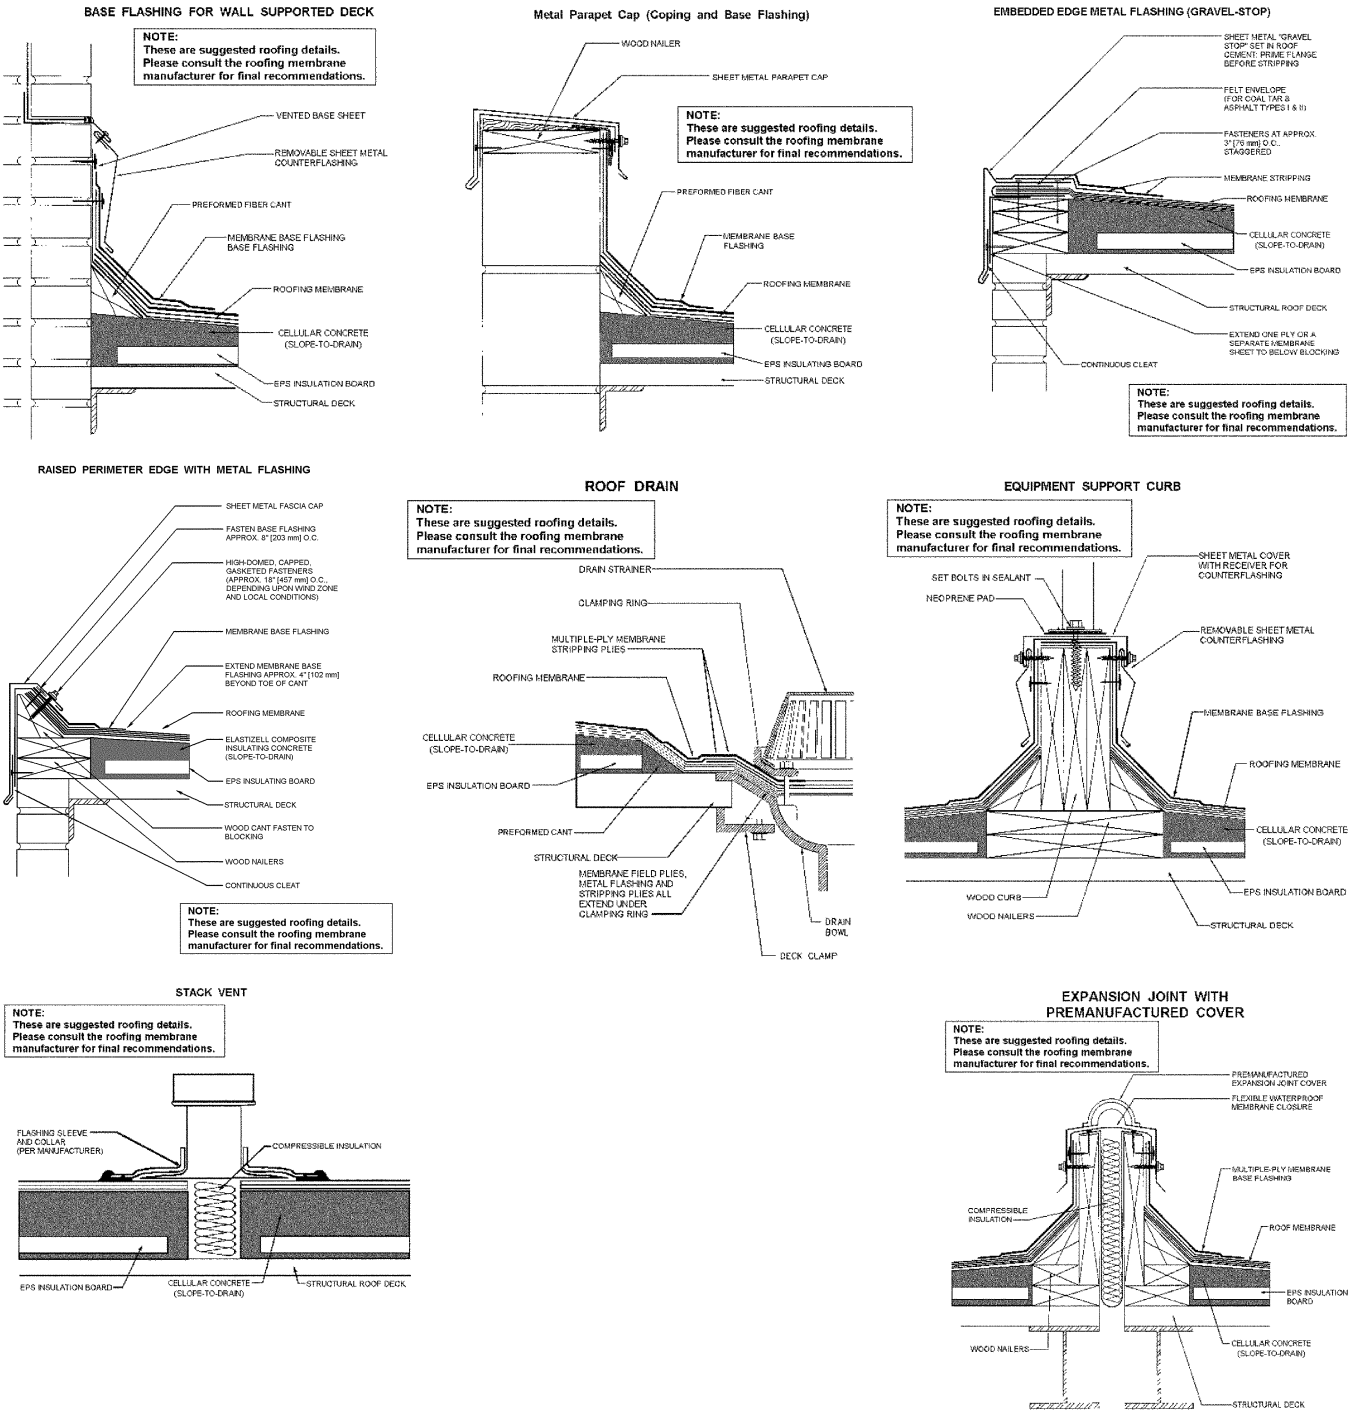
Typical roofing details for cellular concrete roof decks.
